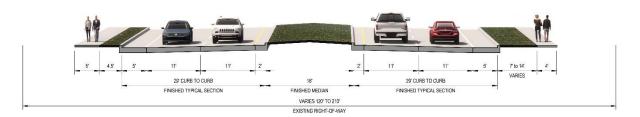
Pavement Replacement with Urban Shoulder Alternative for North Project (WIS 13 to County A), facing north
